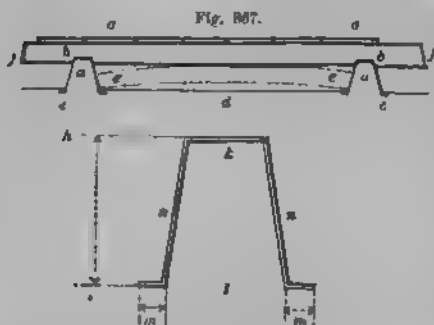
DETAILS OF BEAM—SCALE, 3 INCHES TO THE FOOT.
